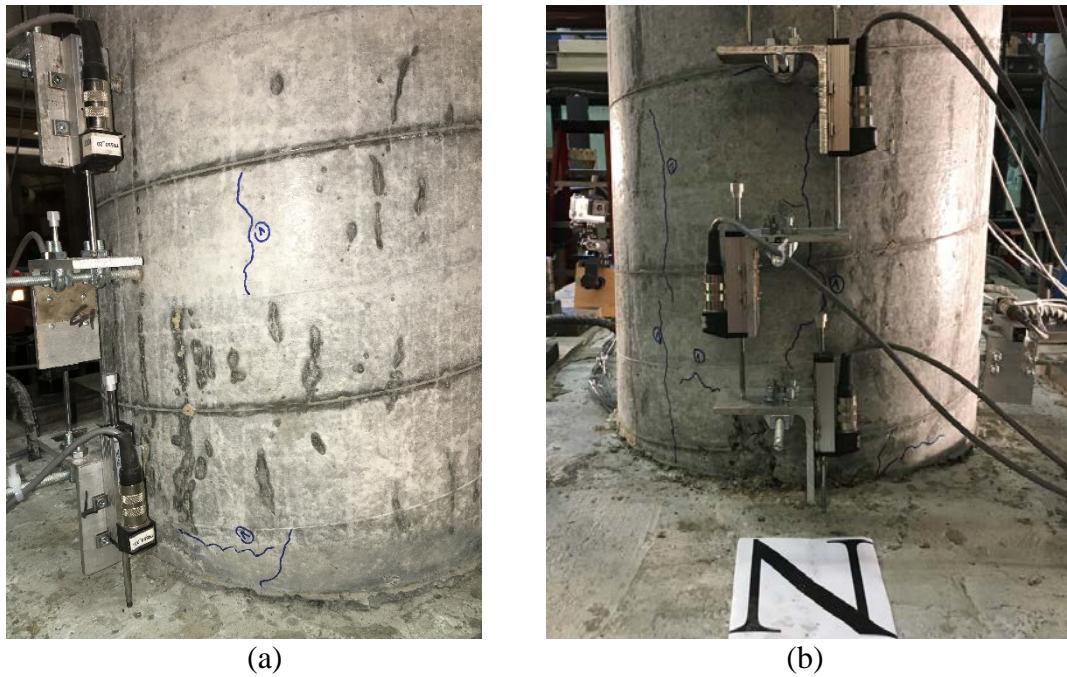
Damage in Column 4 for 1.00 Capitola X. (a) Vertical and horizontal cracks on south side (b) Spalling of concrete cover and vertical cracks on north side
